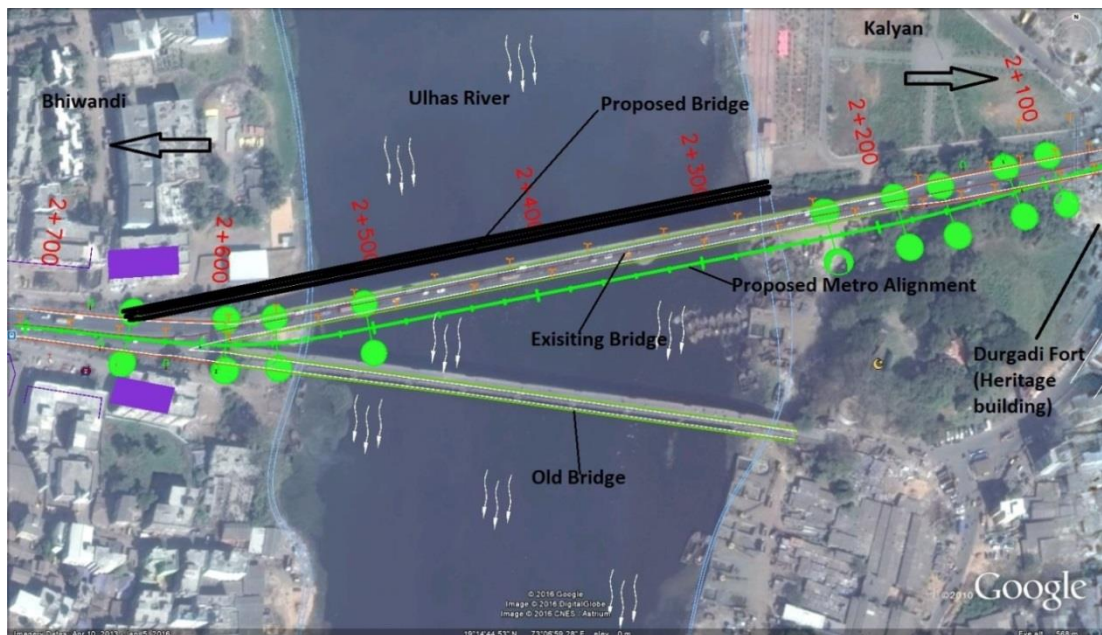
Section of Alignment showing Proposed Bridge over Ulhas River
